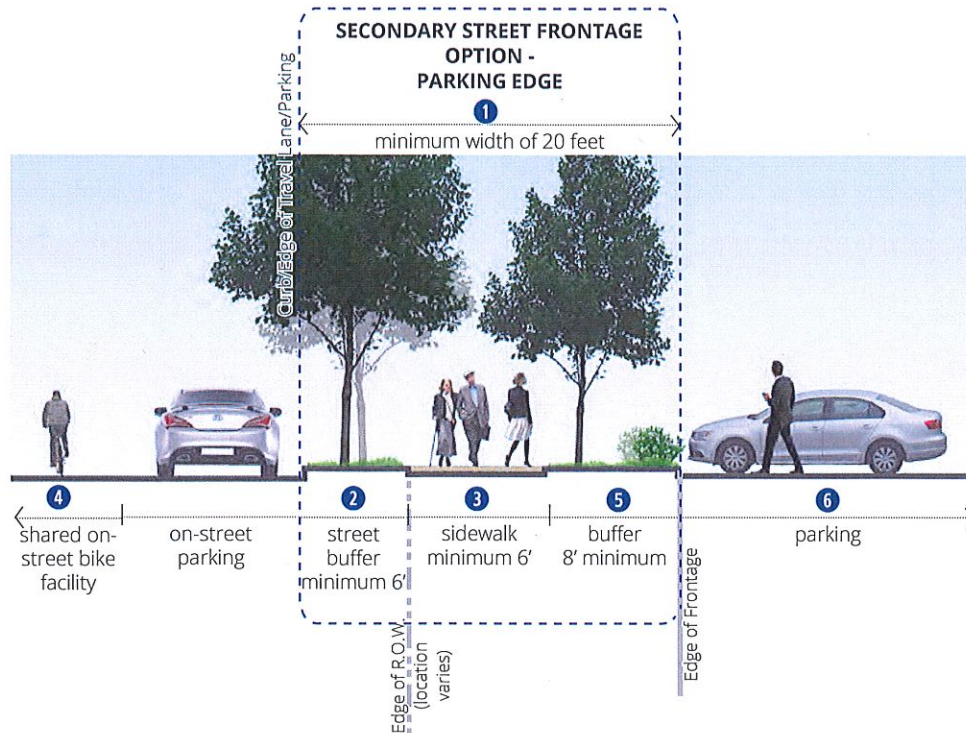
Secondary Street Frontage Option - Parking Edge
